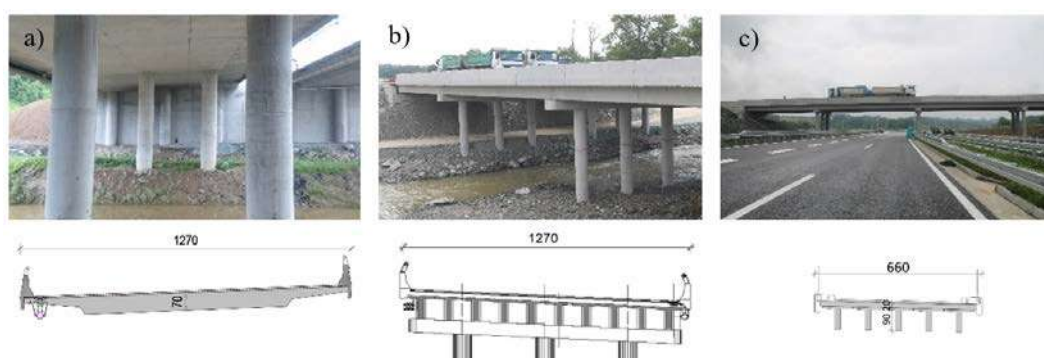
Typical bridges and corresponding cross-sections: a) bridges on the main road - type 2, b) side roads bridges - type 3, c) side roads bridges - type 4.
